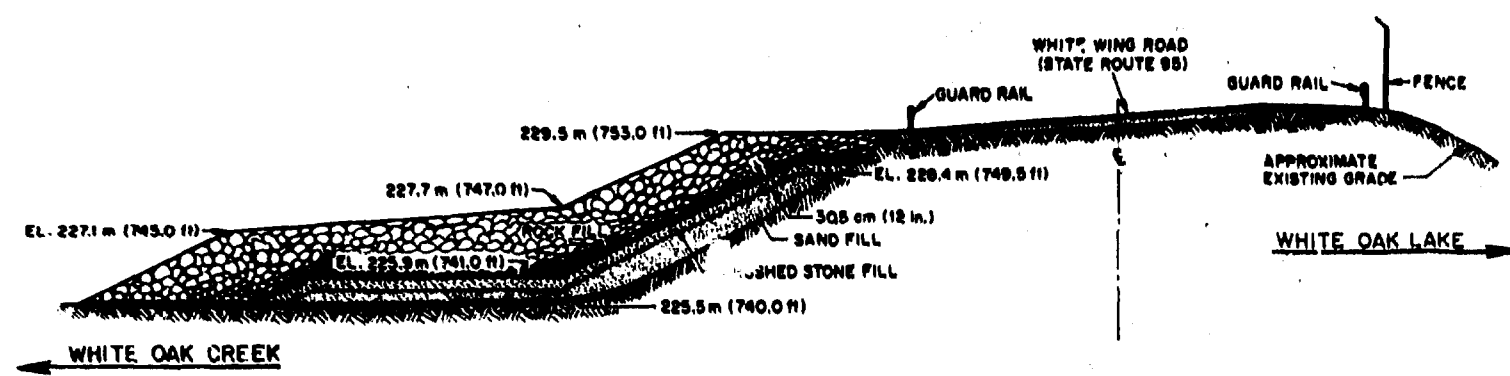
Schematic cross section of the berm at White Oak Dam.
